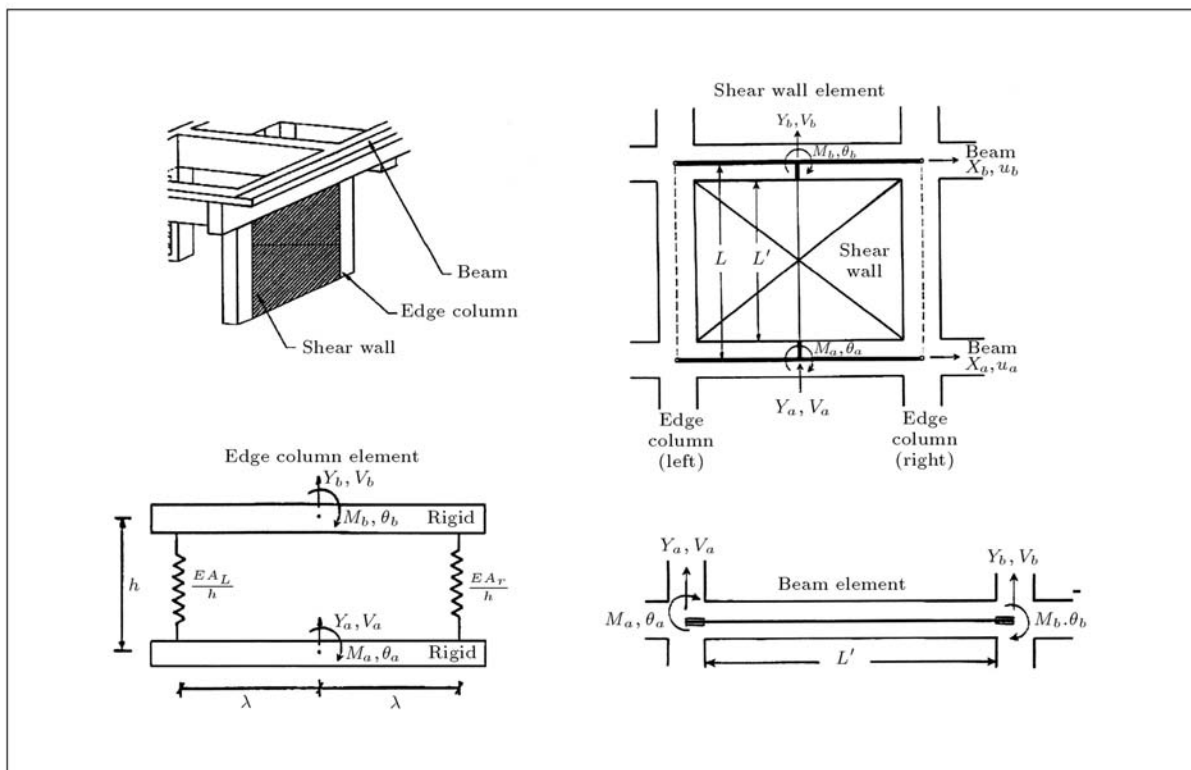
Structural elements used in modeling masonry buildings (IDARC 4.0 [9]).
